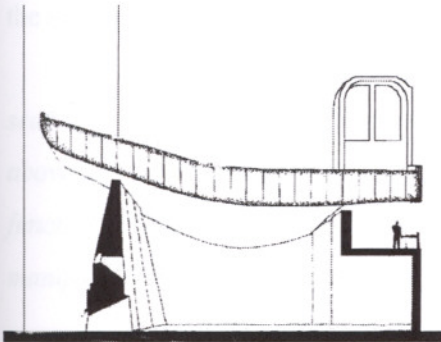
46 Section showing the roof structure of Notre Dame du Haut (Millet 1996 p65)
